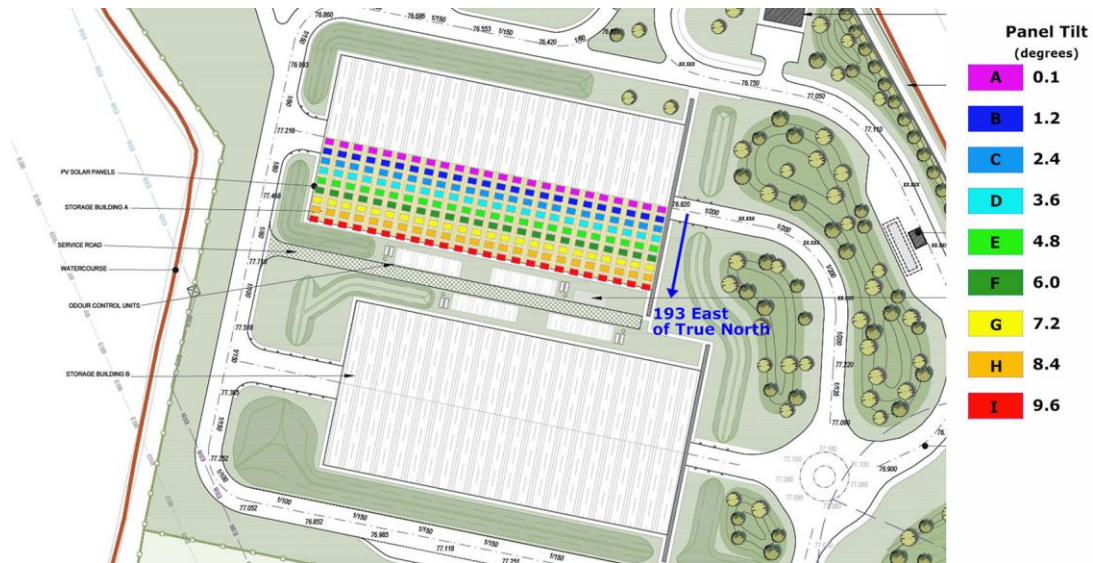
Orientation and tilt of the panel layout used to calculate glint and glare
